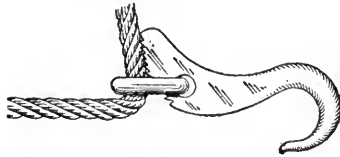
ROPE-GRIPPING HOOK FOR HANDLING TIMBER.
